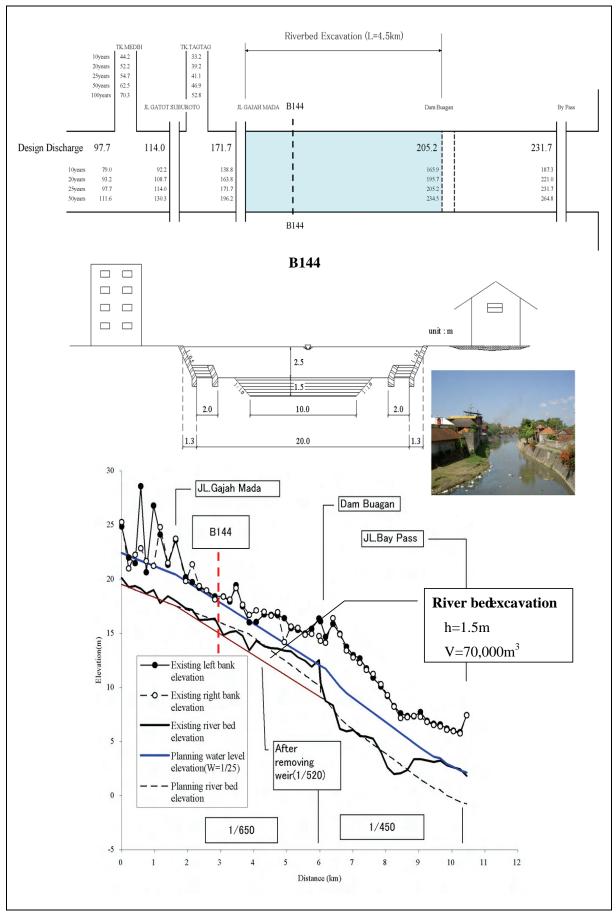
Flood Control Plan for Badung River (Riverbed Excavation)
